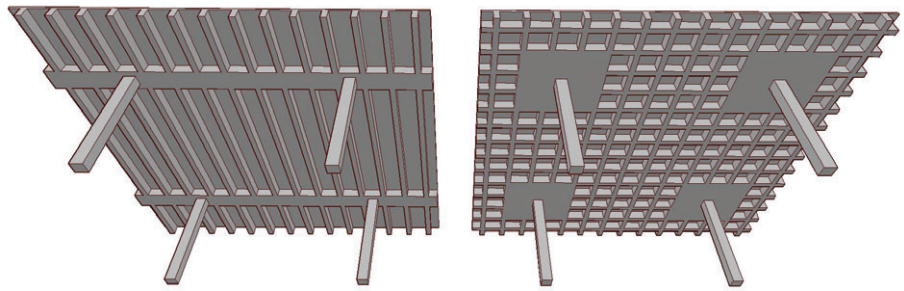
Concrete structural floors made of rows of T-beams without transverse reinforcement: (a) one-way ribbed slab and (b) two-way ribbed slabs.
